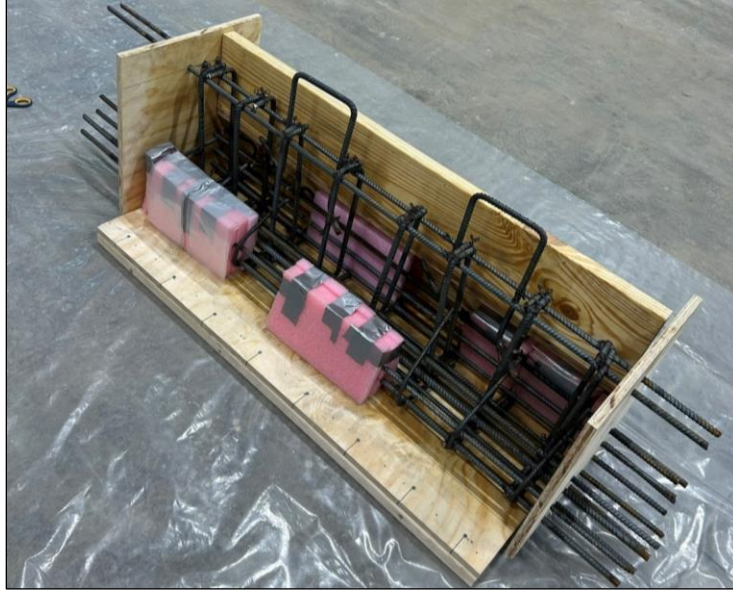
Photo. Foam block outs to create bottom flange voids in the mini girders.
